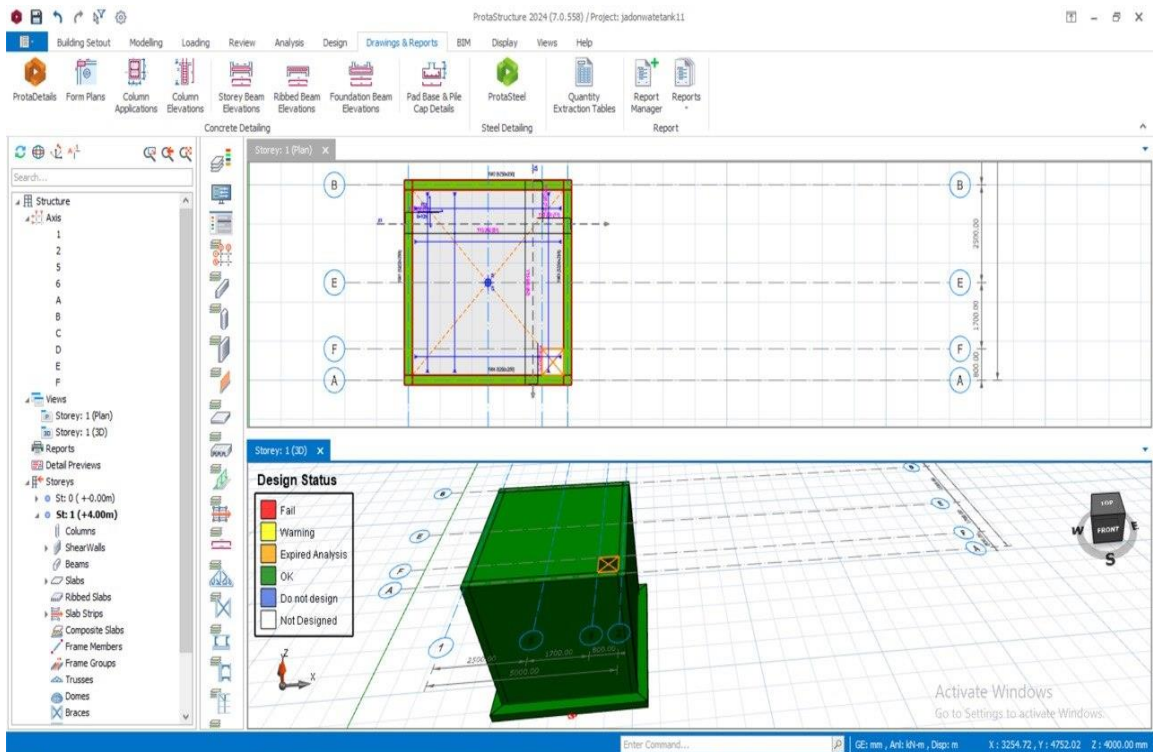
further illustrates the 2D plan layout with the 3D structural model of the tank walls (shear walls) generated using ProtaStructure Software. The model provides a spatial representation of the structural framework, showing tank walls (shear walls), which serve as the primary water-retaining elements, and successfully designed as 250 mm thick reinforced concrete walls. These walls were reinforced using high-yield steel bars (Grade 500) with 12 mm diameter bars spaced at 250 mm centers in both vertical and horizontal directions (H12-250) on both faces of the wall.
